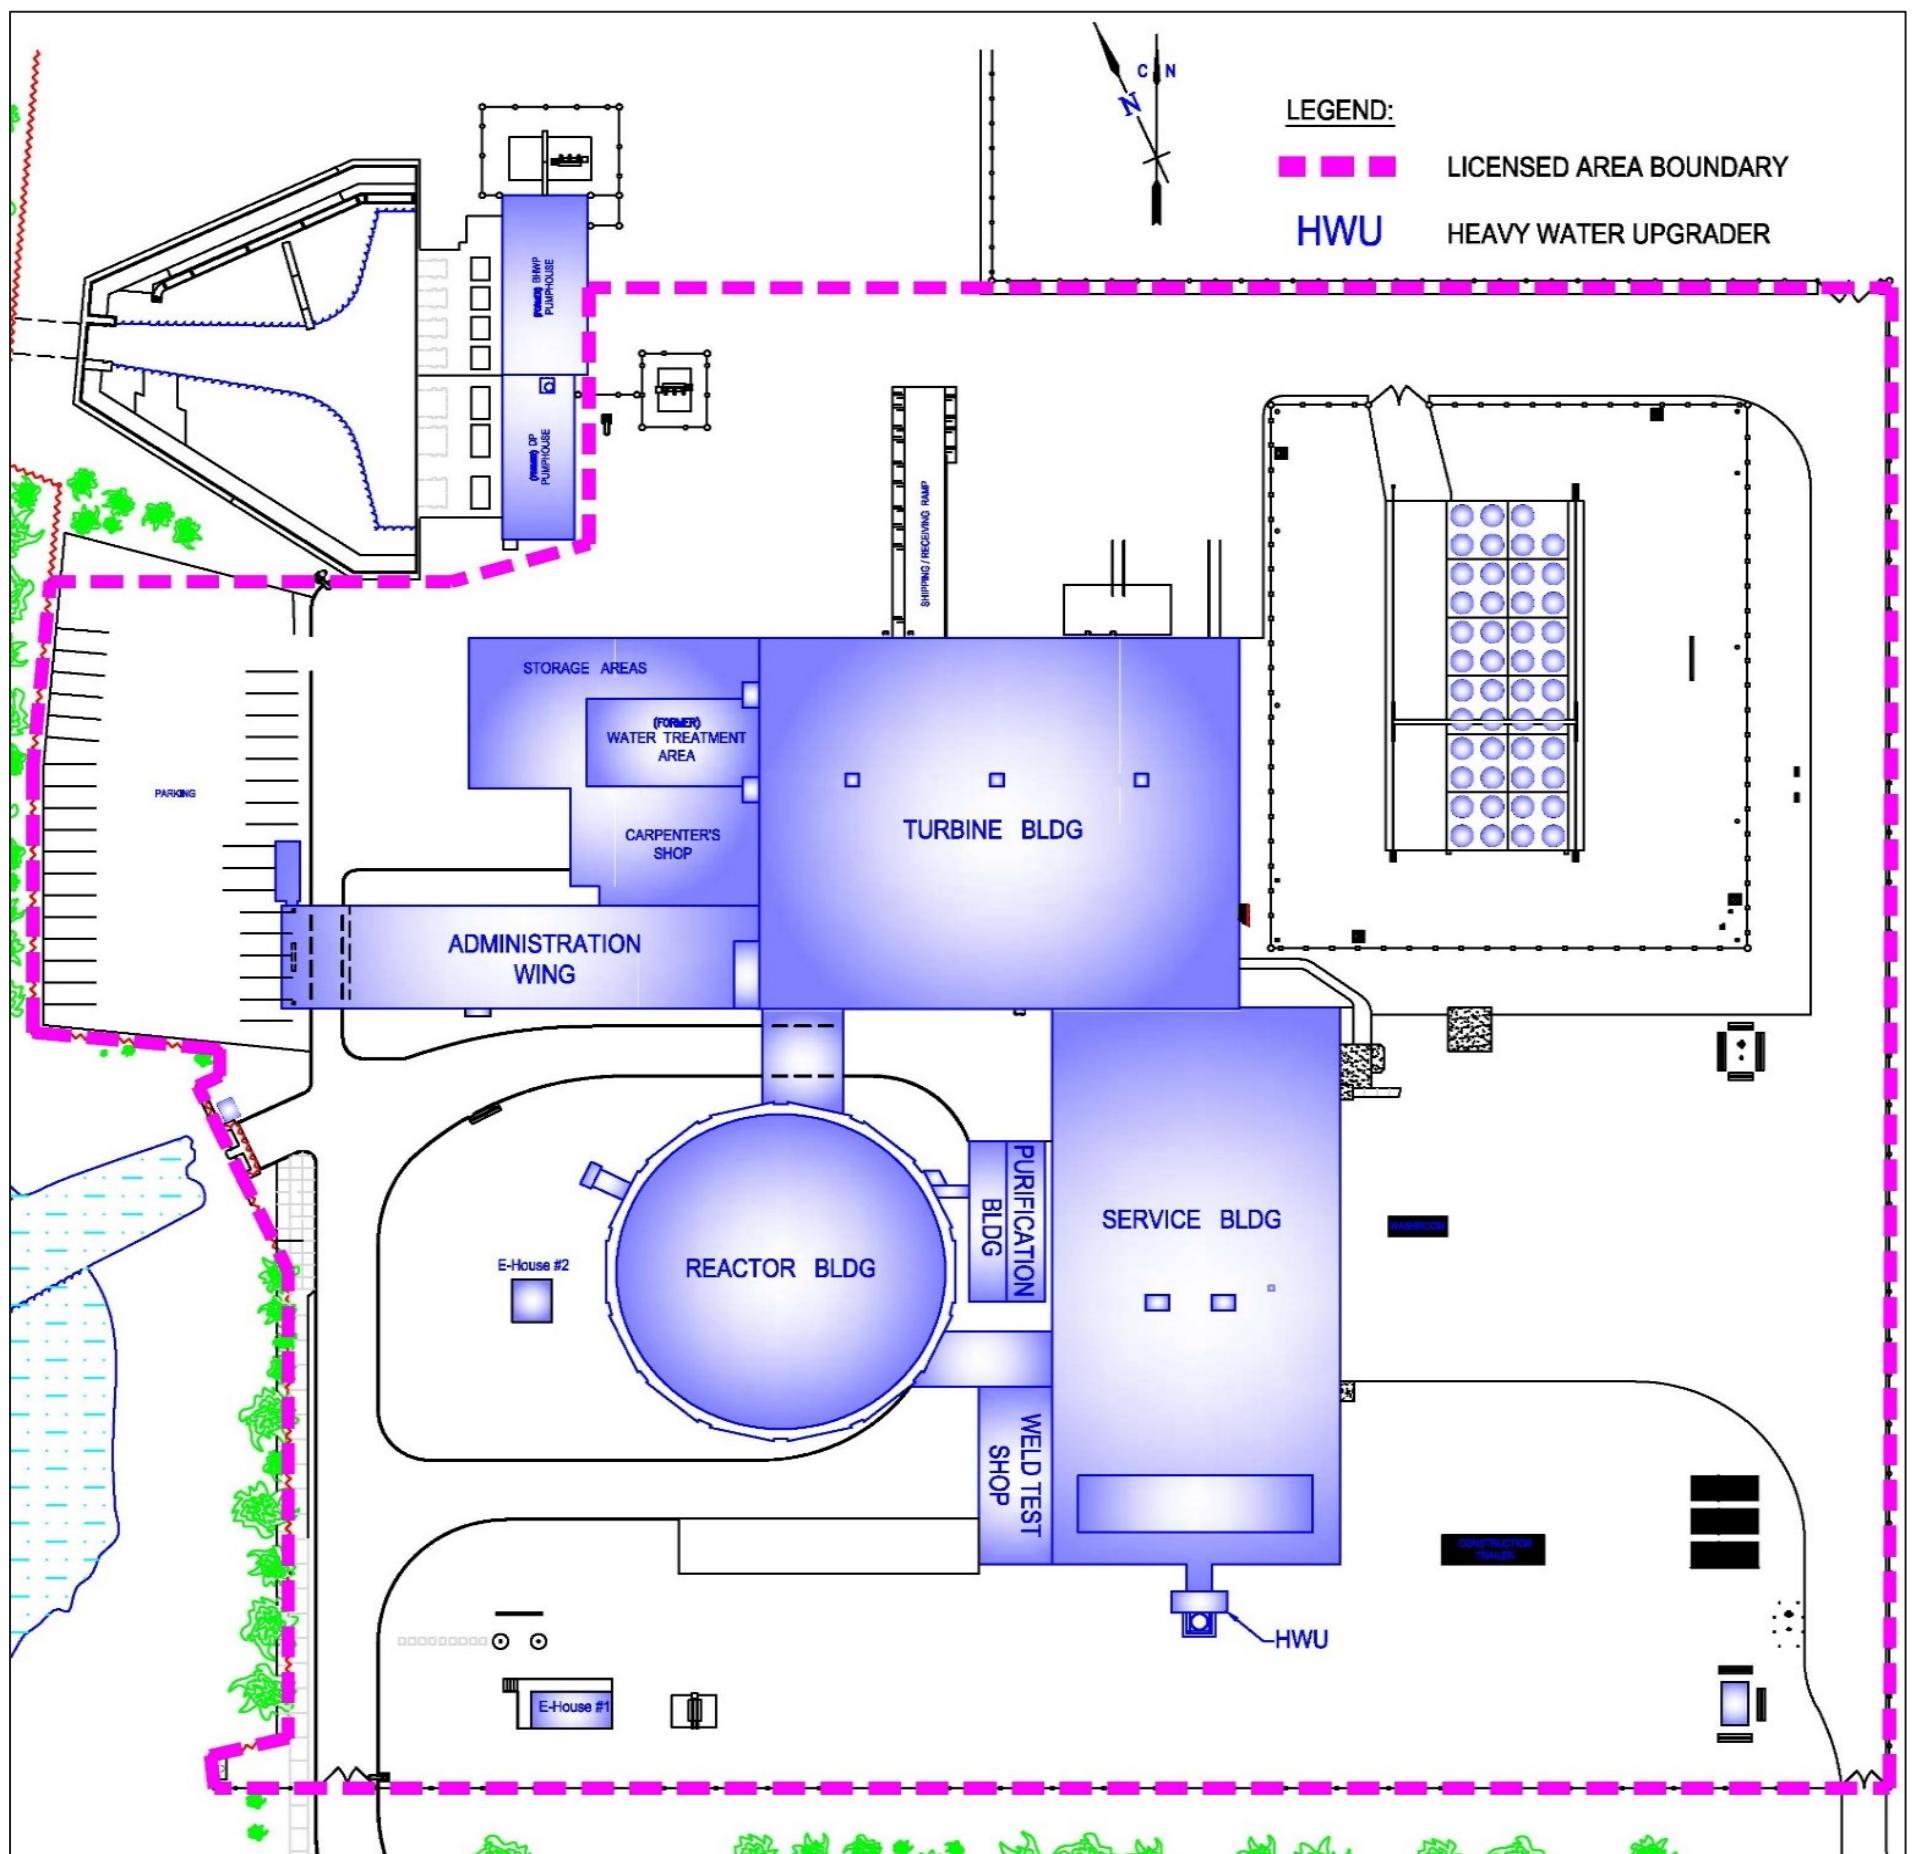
Layout of Douglas Point Waste Facility (DPWF) (CNL 2019a)
